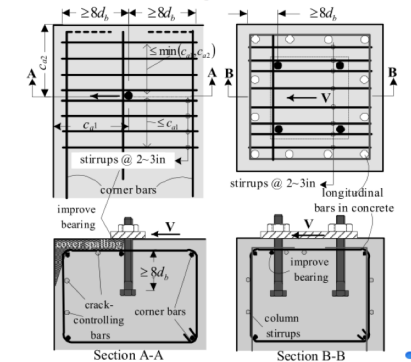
anchor reinforcement for shear.
